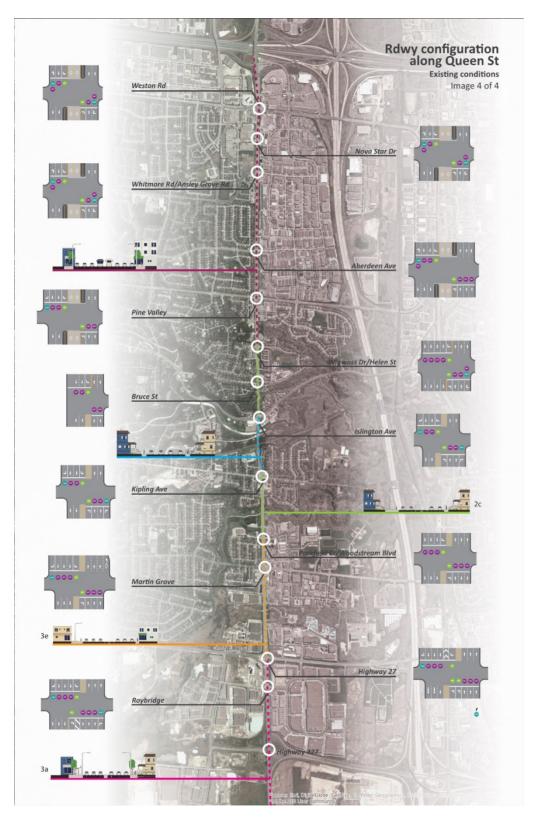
Roadway configuration along Queen Street/Highway 7, Highway 427 to Weston Road
